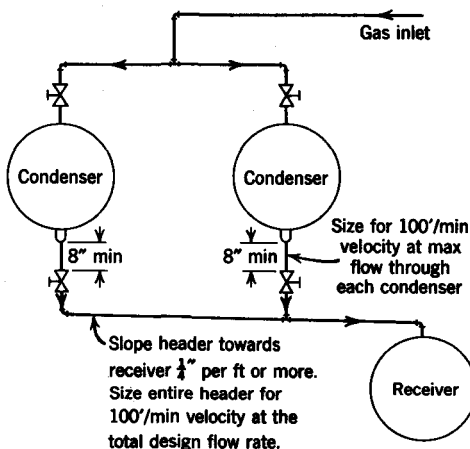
Parallel shell-and-tube condensers with top inlet receiver. (Courtesy York Corporation.)
